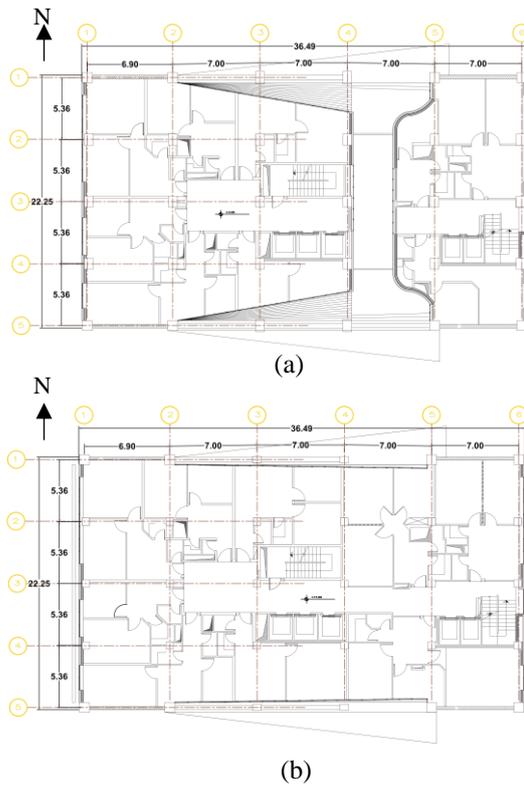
Plan of Zone 1 (a). Plan of Zone 2 (b)
